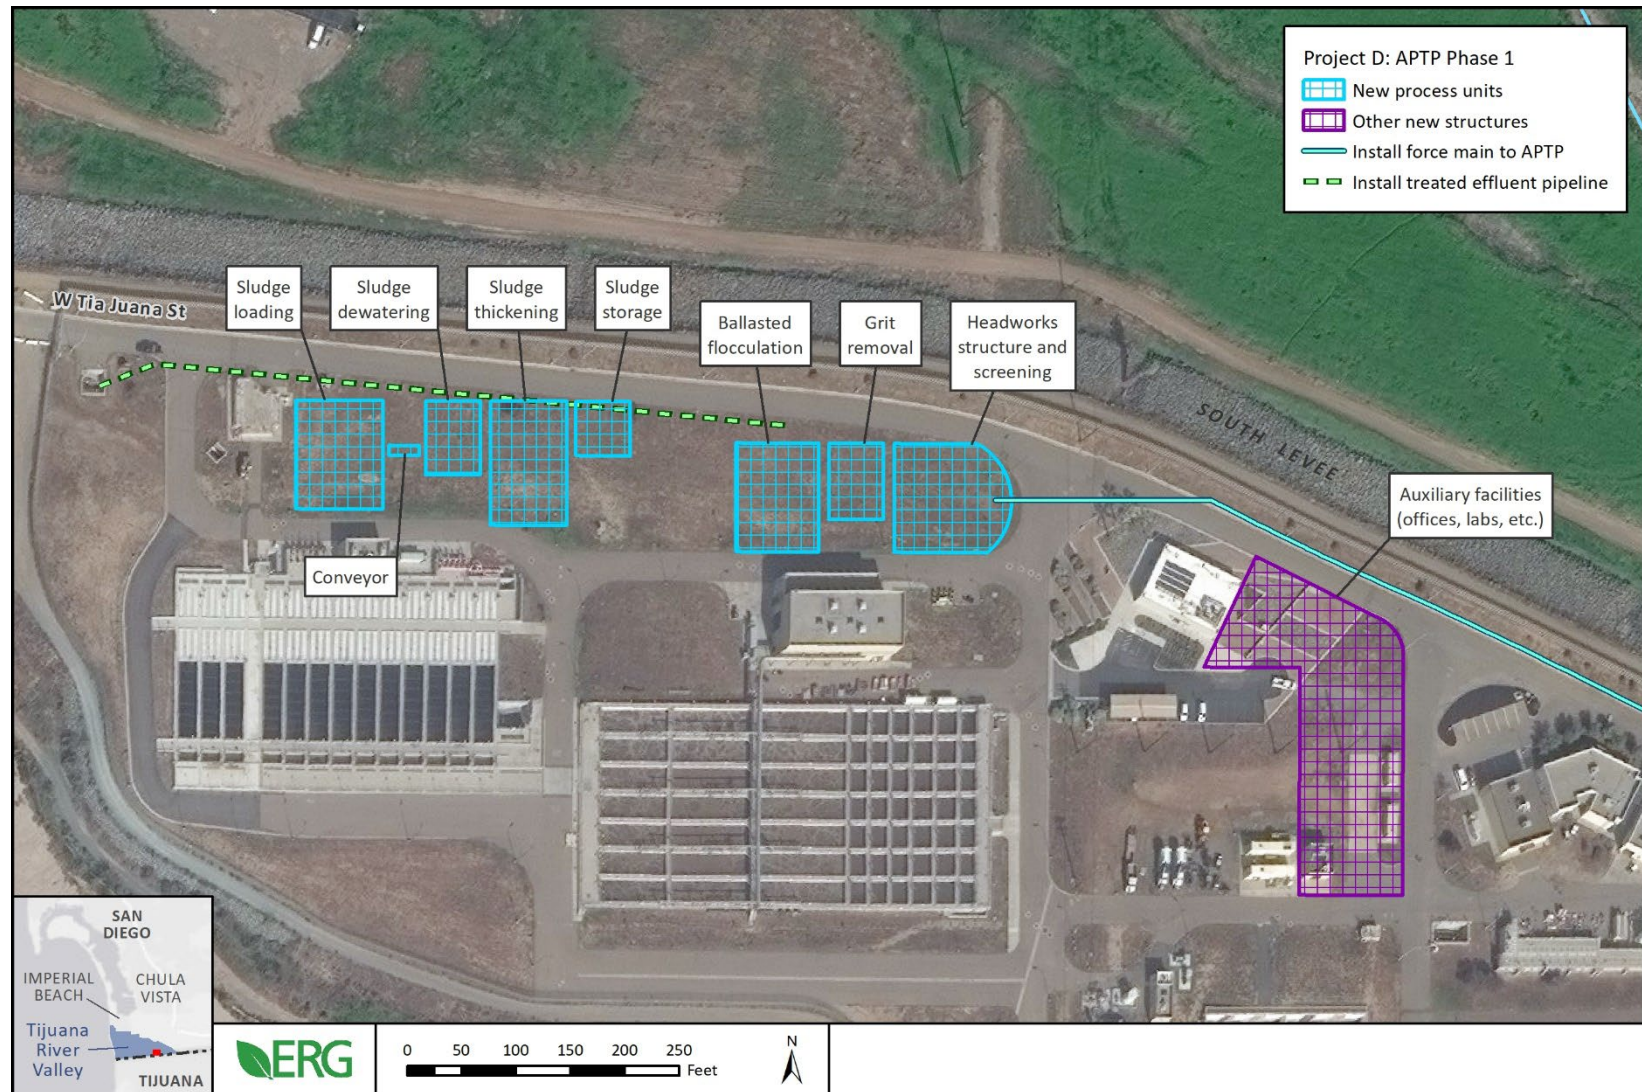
Project D (AFTP Phase 1) - Conceptual Site Plan of Proposed Facilities.
